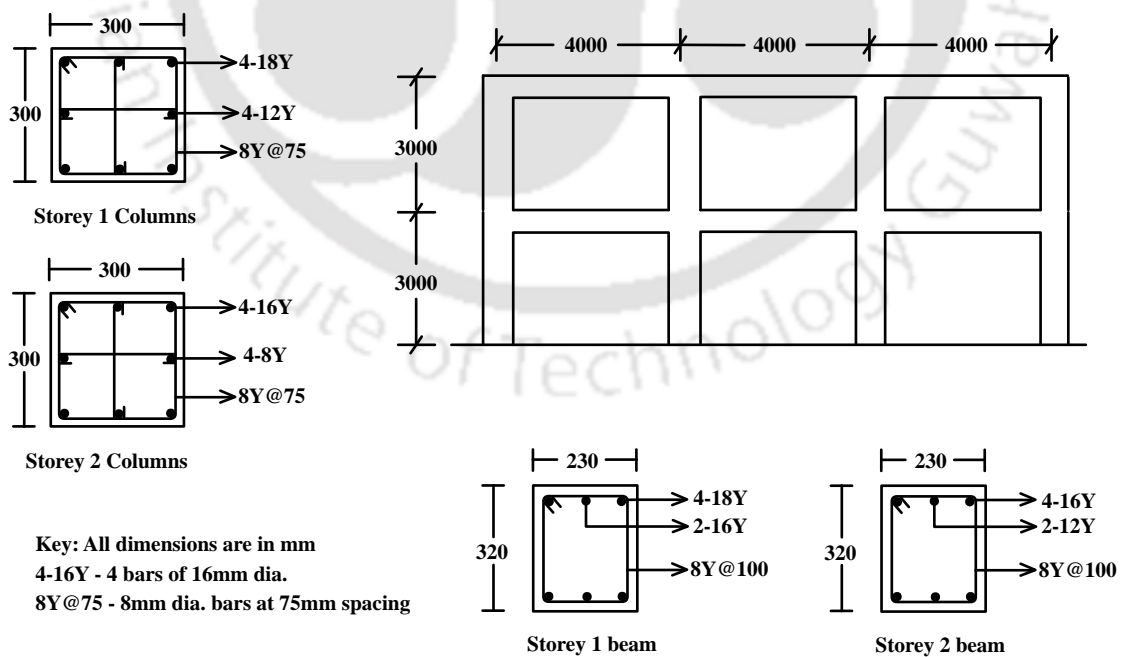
Geometry (not to scale) and sectional details of the 2-storey frame
